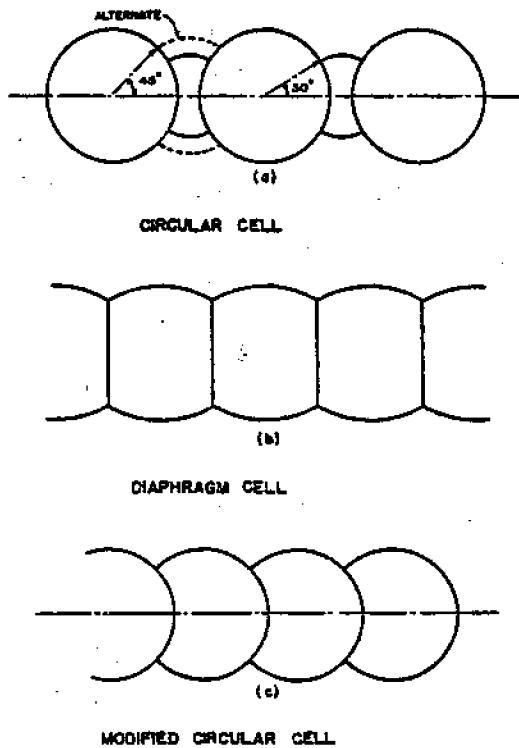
Sheet Pile Arrangement for Cellular Walls
